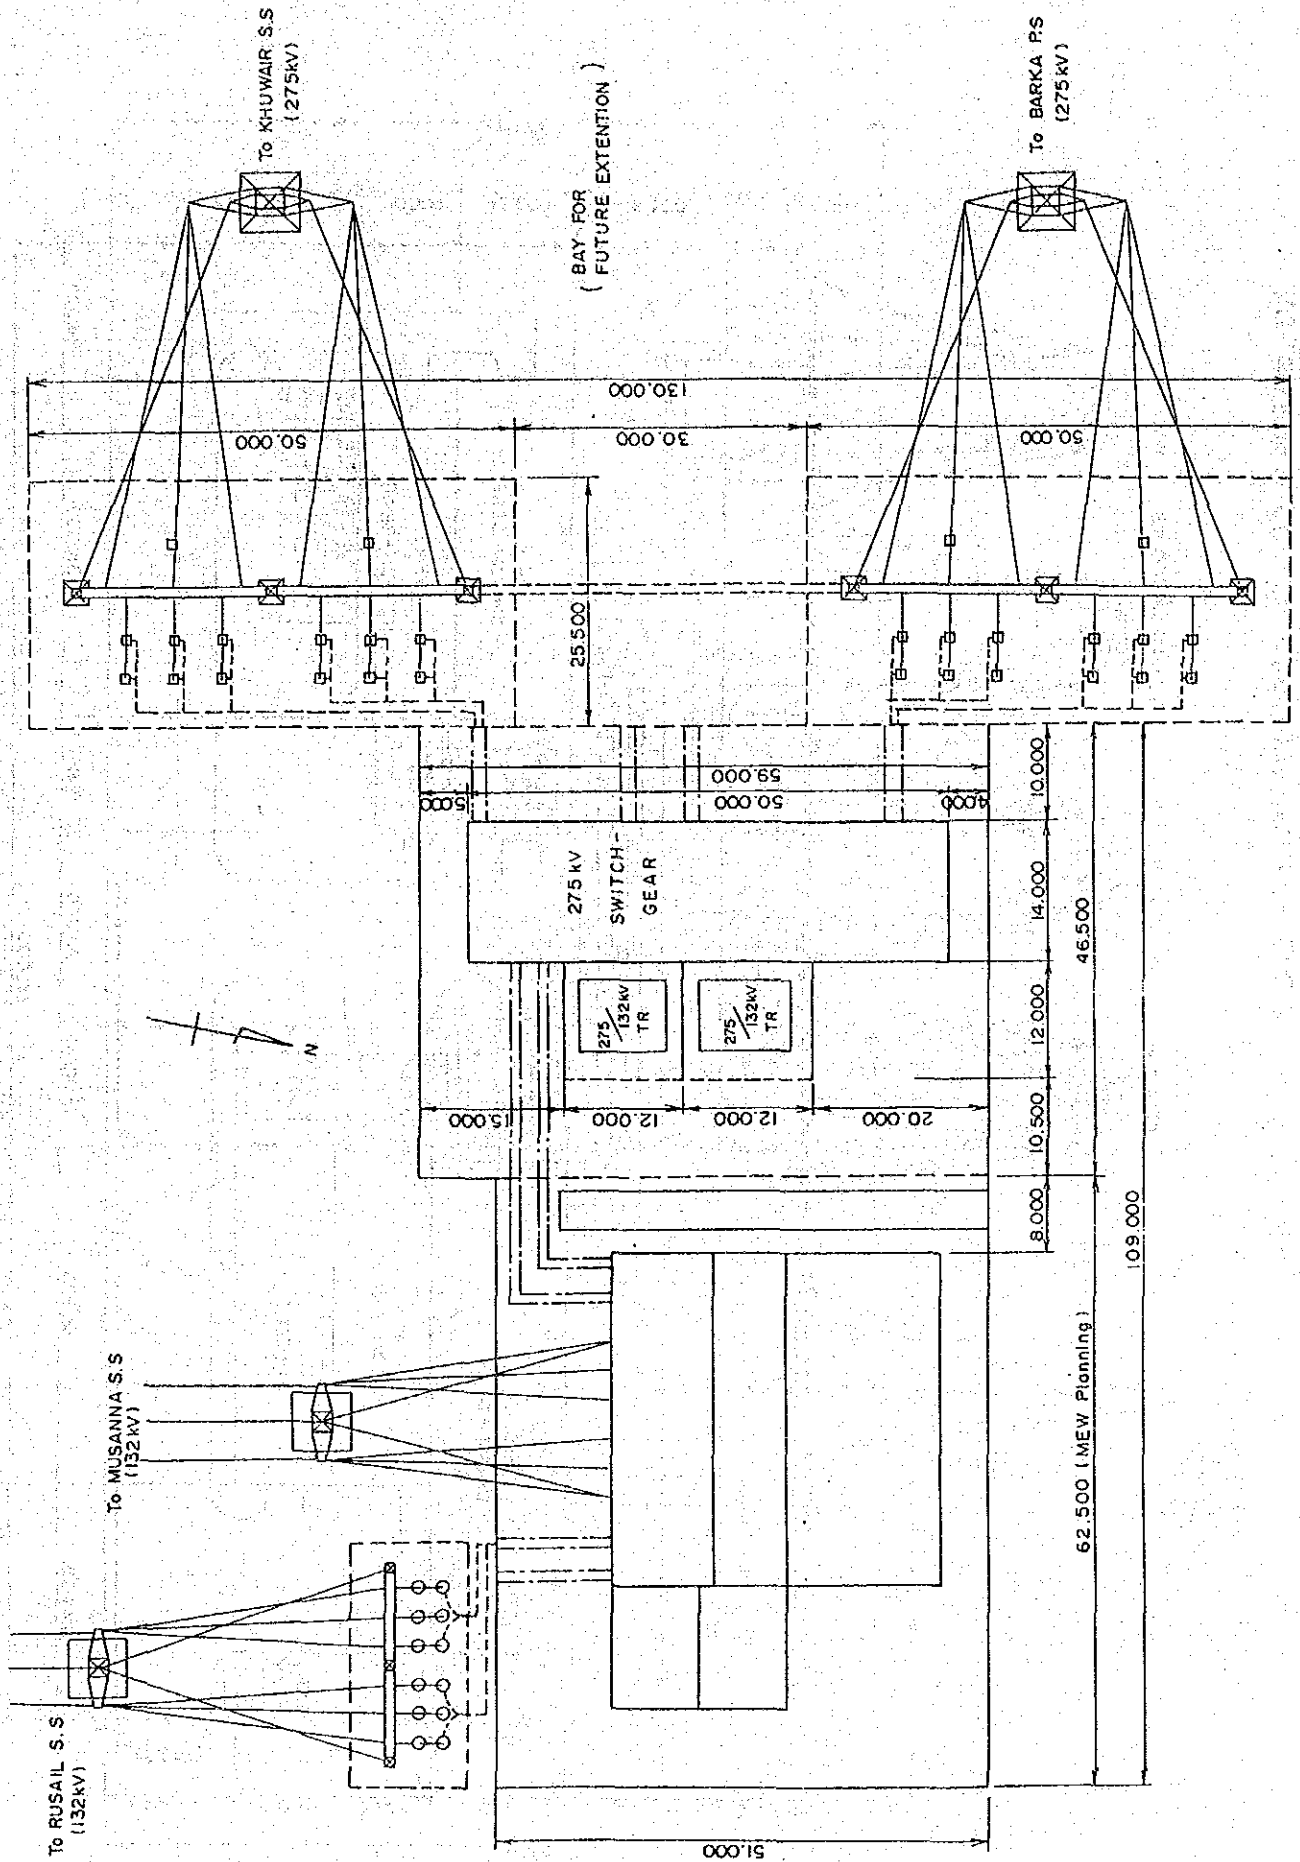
LAYOUT FOR KHUWAIR 275/132/33KV SUBSTATION
